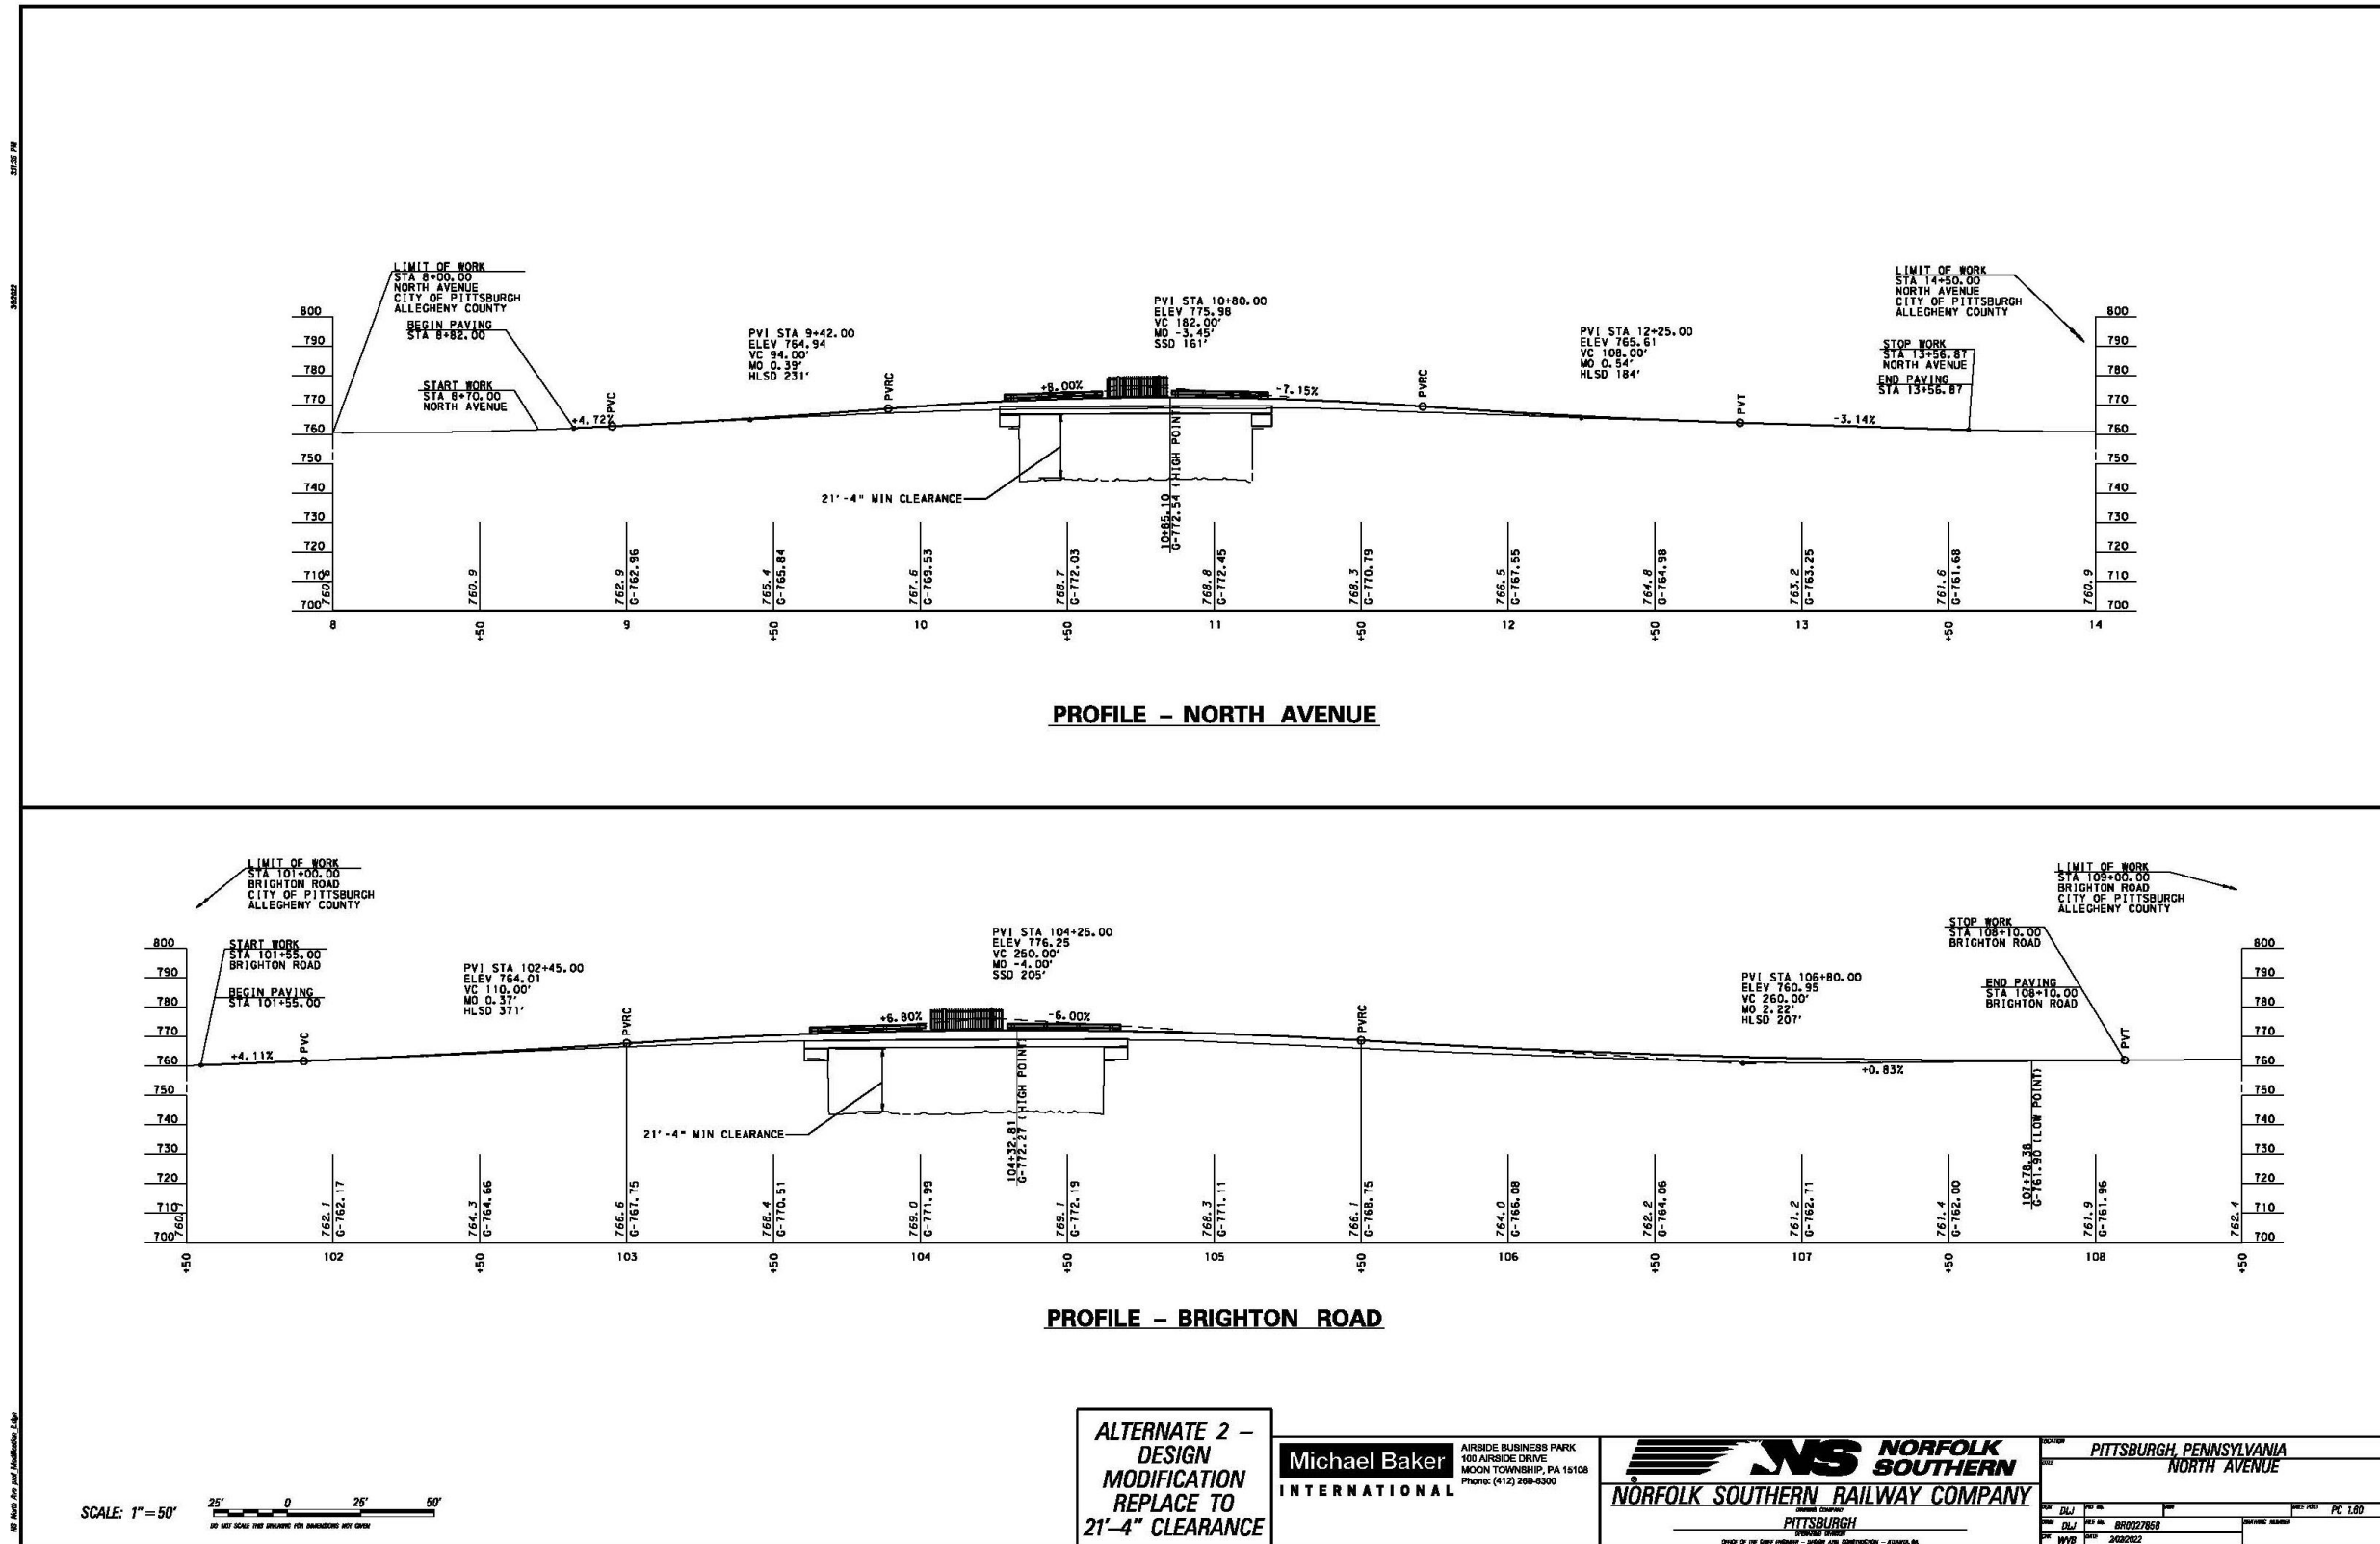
Profile view showing the proposed bridge structure and changes to the roadway, and sidewalks.
